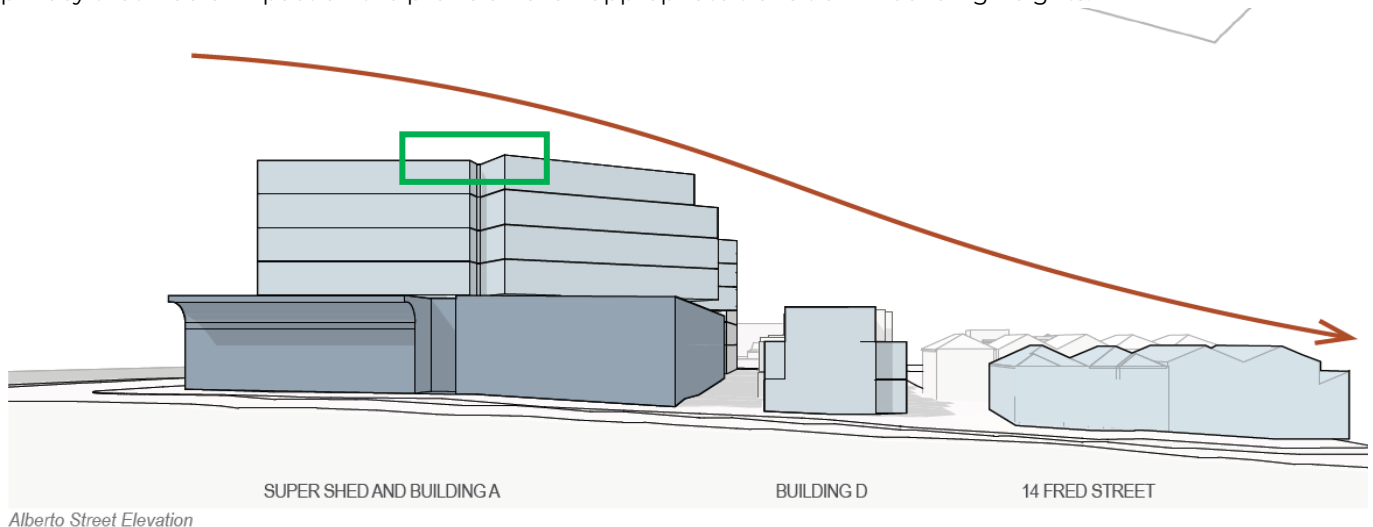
Diagrammatic Elevation and Transition viewed from Alberto Street (general location of the varying elements shown in green)
